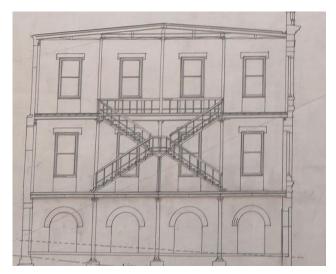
Section C-D of Strong Room (internal section facing towards inner face of western wall – showing the double narrow-u staircase, now removed)
